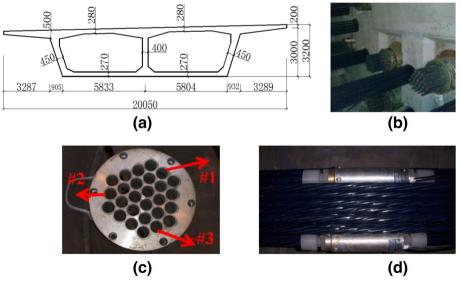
Monitoring of the steel strands in the bridge (unit: mm): a representative cross section of the girder, b external prestressing strands, c layout of monitoring points, and d EME sensors during the construction
